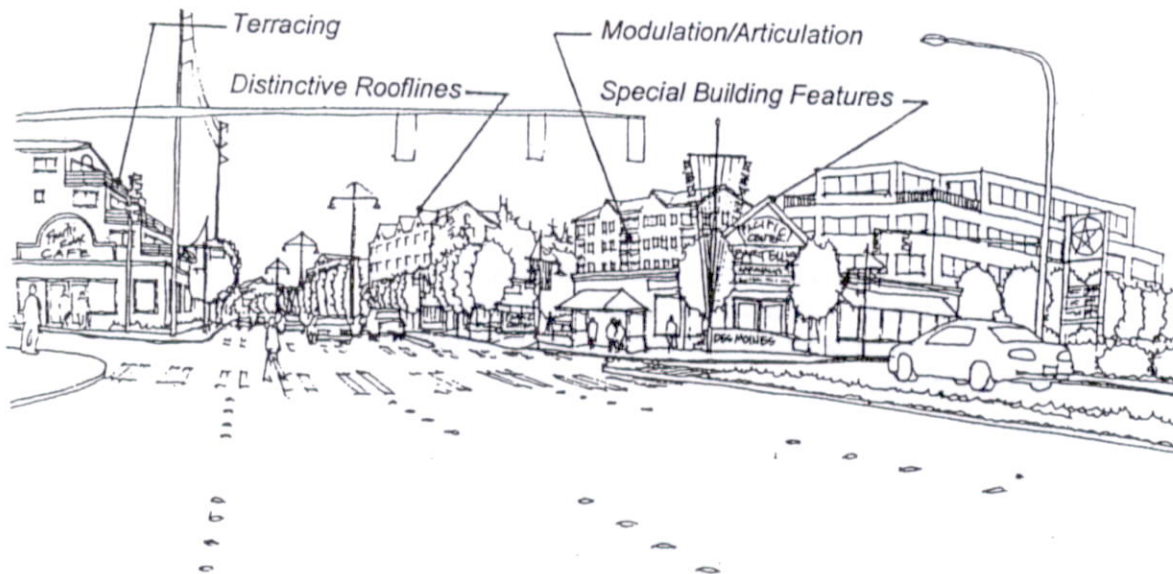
B.2: Varied rooflines, modulation of form, articulation of facades and terracing are all used to reduce the apparent bulk of buildings in this view of potential development on Pacific Highway S
